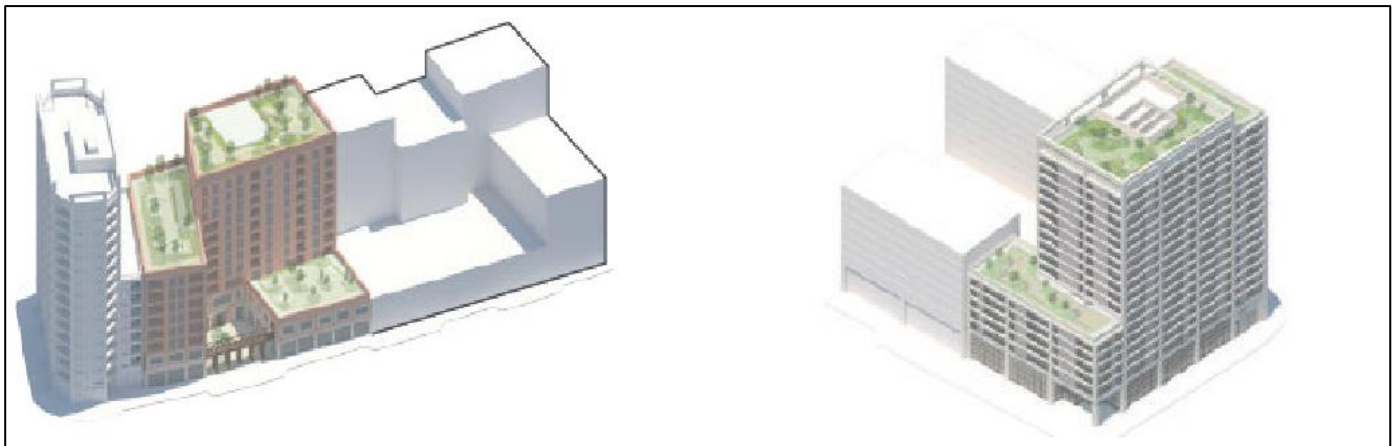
Roof Garden Concept for 67-81 Stirling Road
